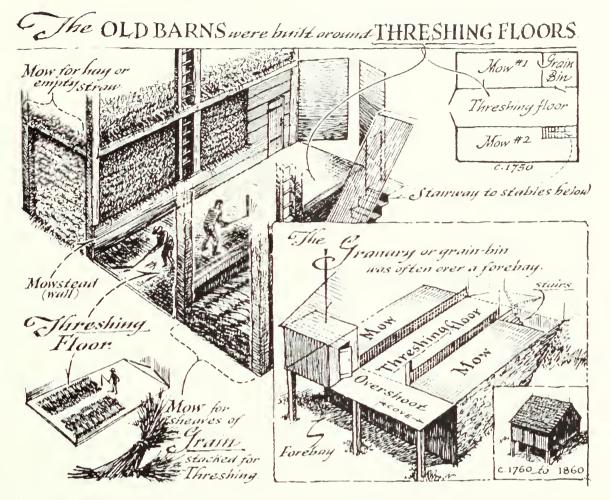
Drawing of the typical layout and function of a Pennsylvania Bank Barn. The design of these barns was centered on the threshing floor. The plan of the Mumma Barn is basically the same, with a few minor changes in its design. Drawing from Eric Sloane. *An Age of Barns*, Henry Holt and Company; New York, New York; 1967, p. 49.
